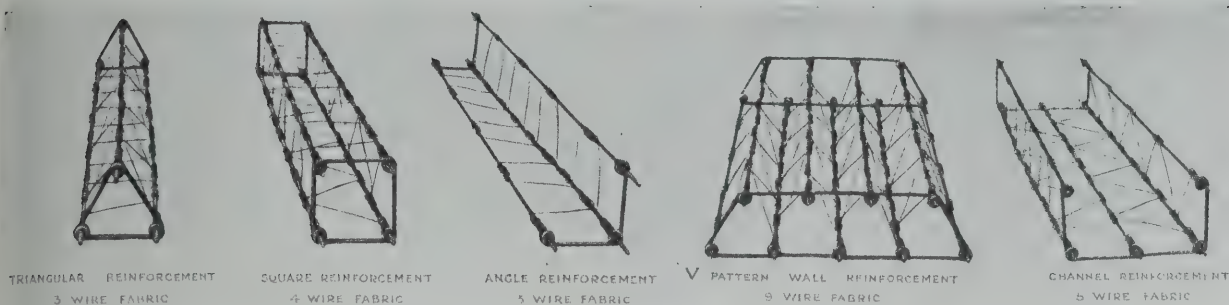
BARB ENGINEERING COMPANY'S REINFORCEMENT.
